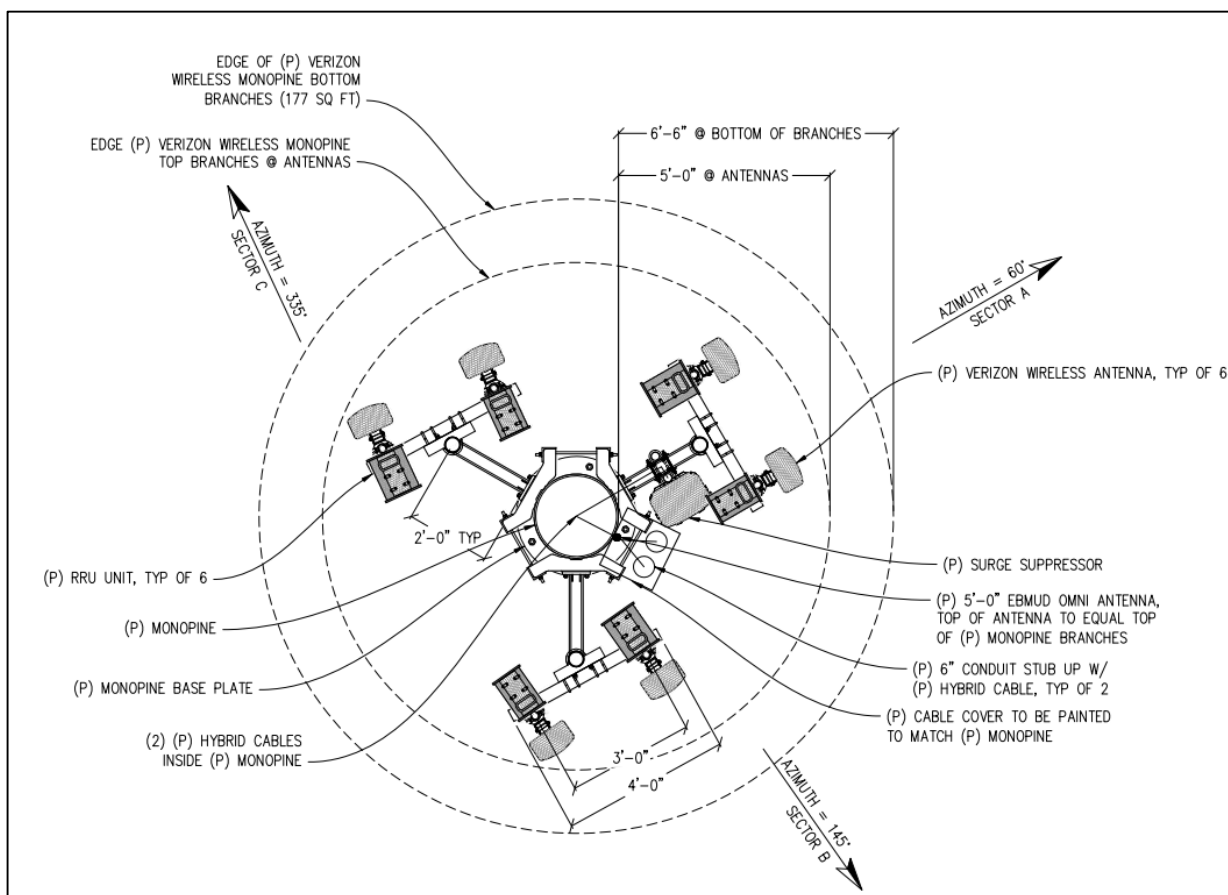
Antenna Plan (Source: Plans, Page A-4).
